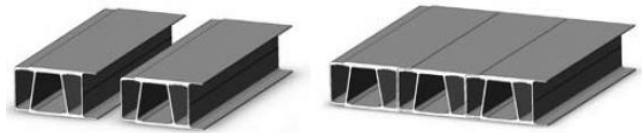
GFRP composite deck with tongue-and-groove connection (Lee and Hong, 2009)
